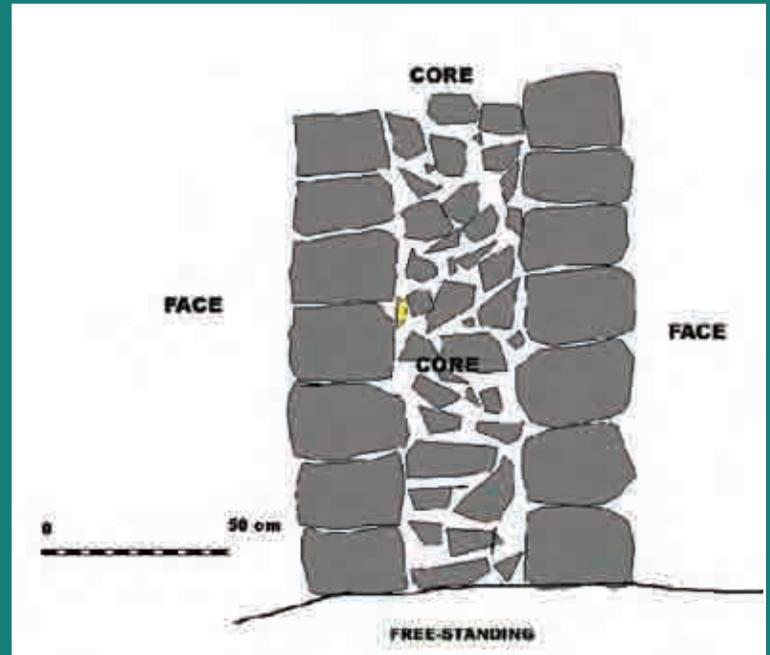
Illustration of the components of a free-standing dry-stone wall
